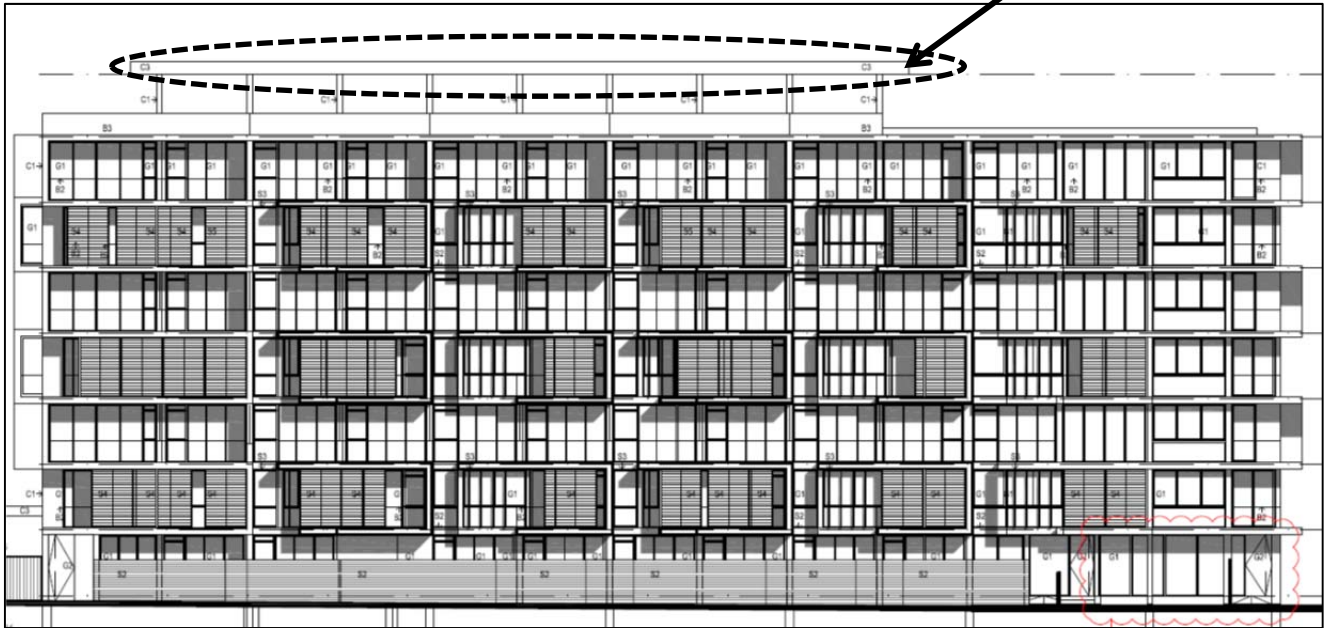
Roof terrace shade structure element of Building B in breach of the approved Stage 1 building height
